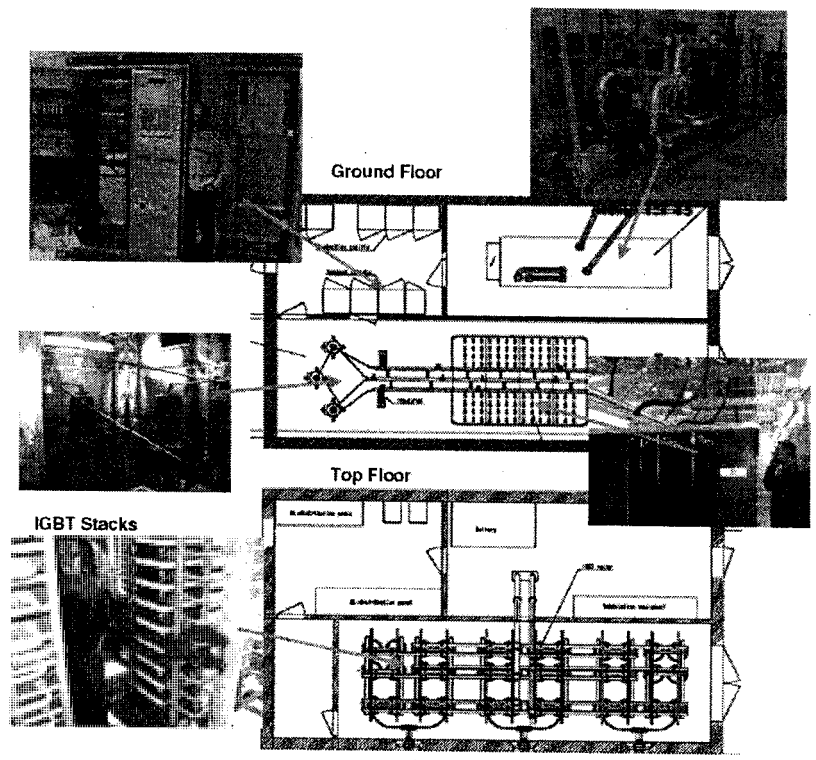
Typical layout of a STATCOM-building (Source: ABB)
